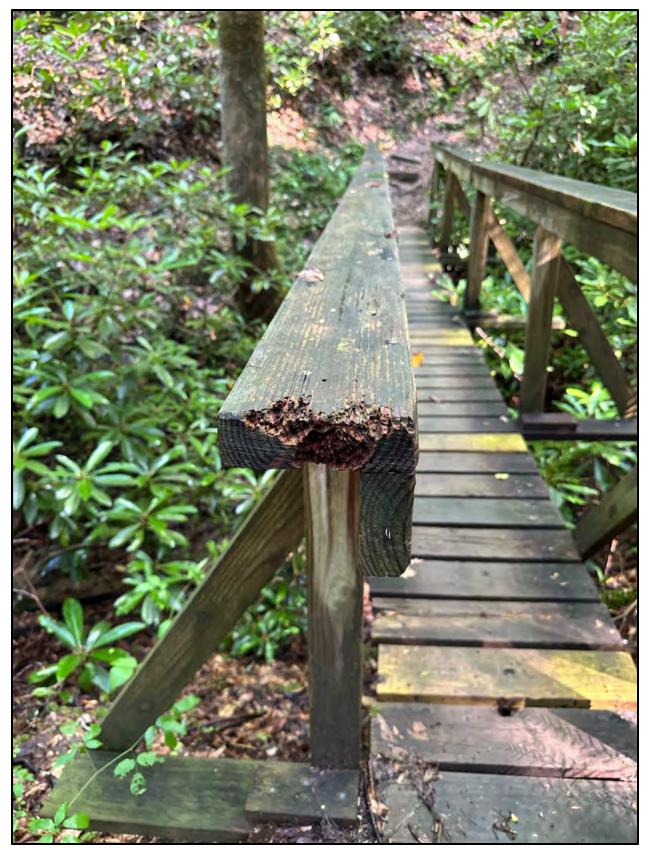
Trail Issue #68 - Foothills Trail, Bridge/Bridge (see Figure 4.17)
